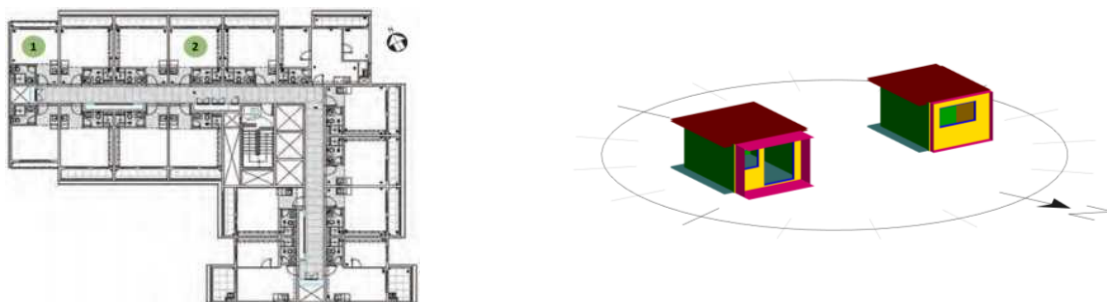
Floor plan for residential building (1 - Studio 19m² and 2 - Studio 25m²) and 3D model on TAS (MAC, 2021)
